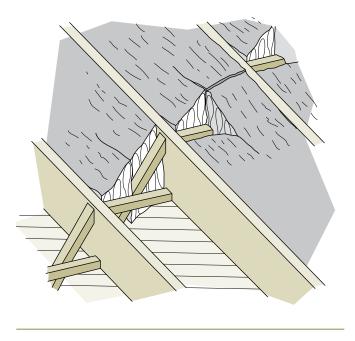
The top layer of insulation runs perpendicular to the bottom layer
